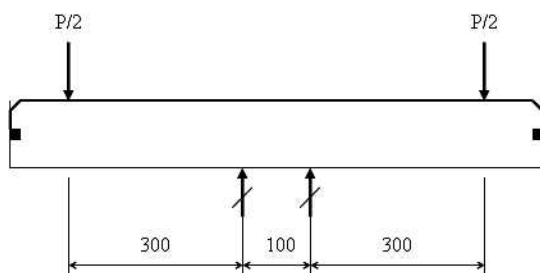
Modified test setup: Plain concrete beam strengthened using fiber strands
